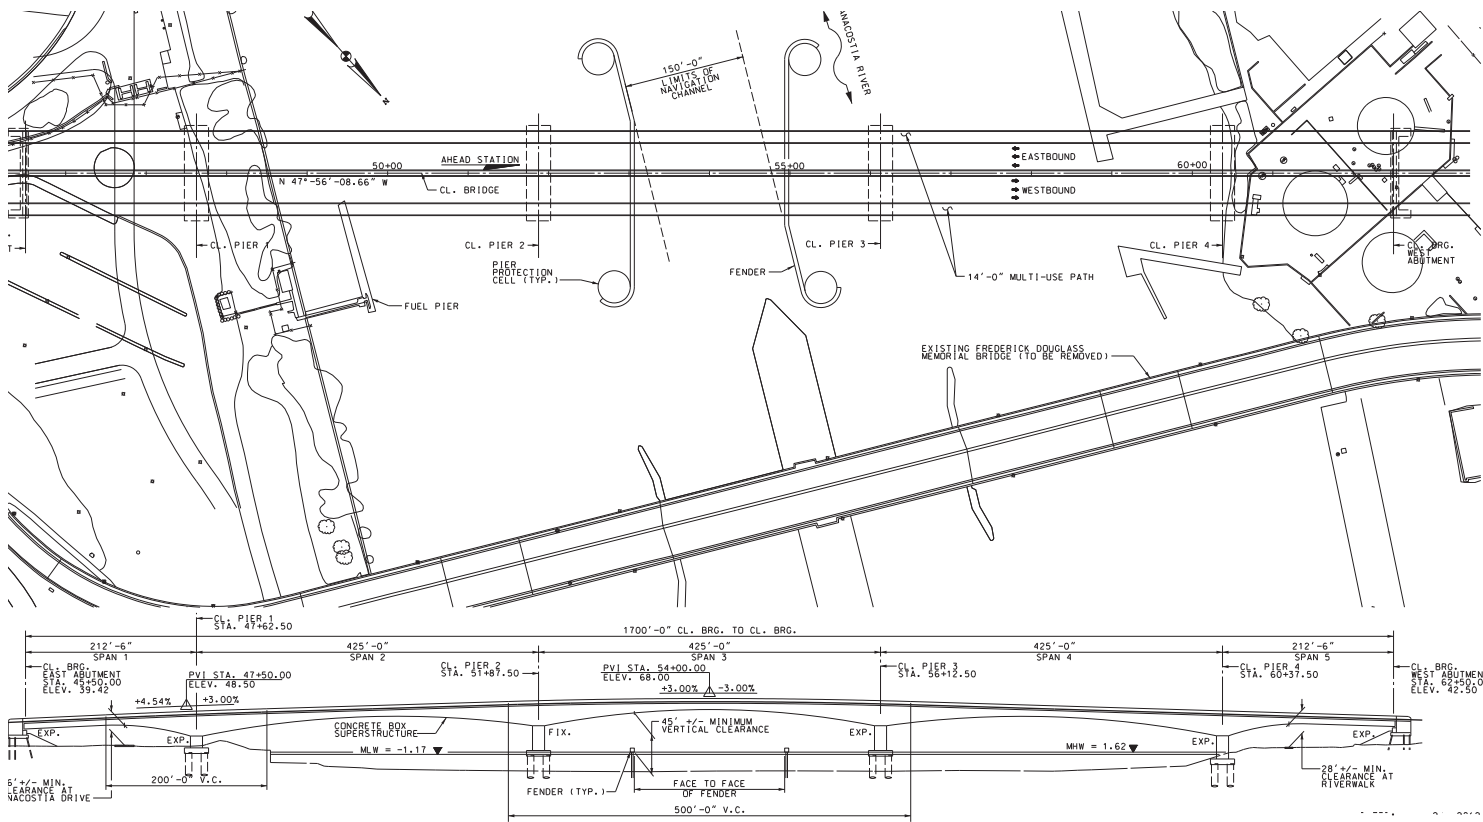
Bridge Alternative 4 - Plan and Elevation
